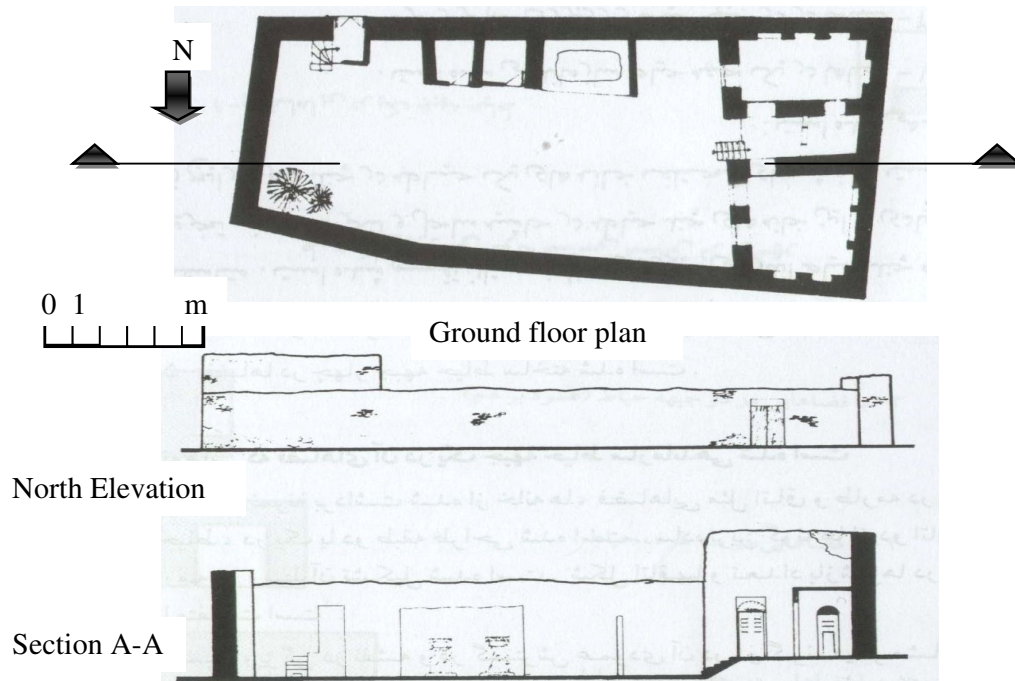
Vernacular building situated just on one side of the courtyard (Memarian.GH, 2006)
